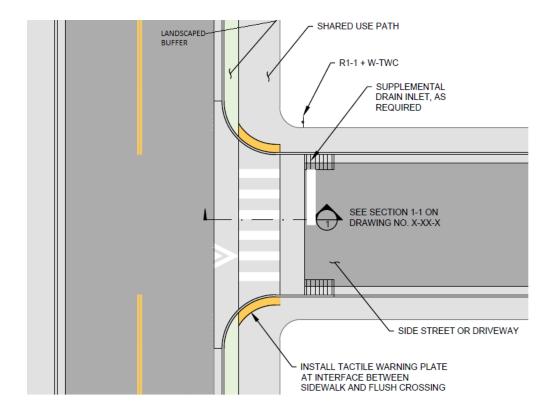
Typical Layout of Raised Crossing at Intersection Leg Location
